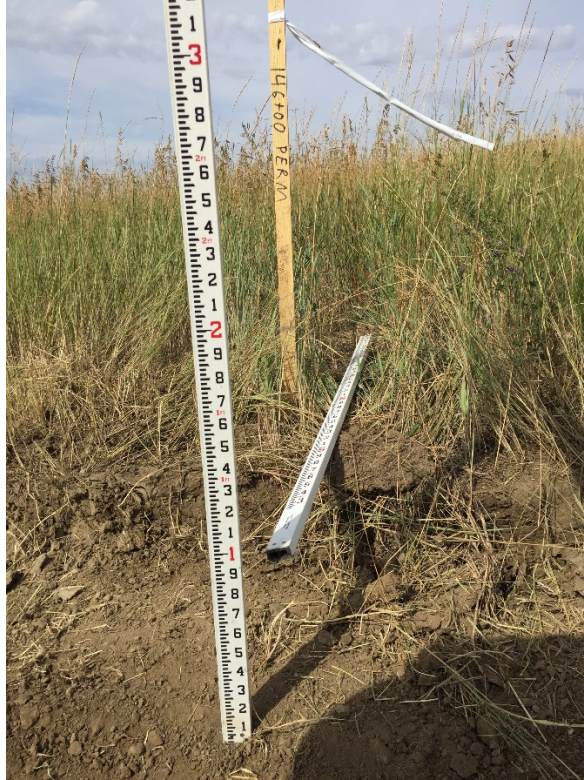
Sta. 146+00 9-10 inches of topsoil.
